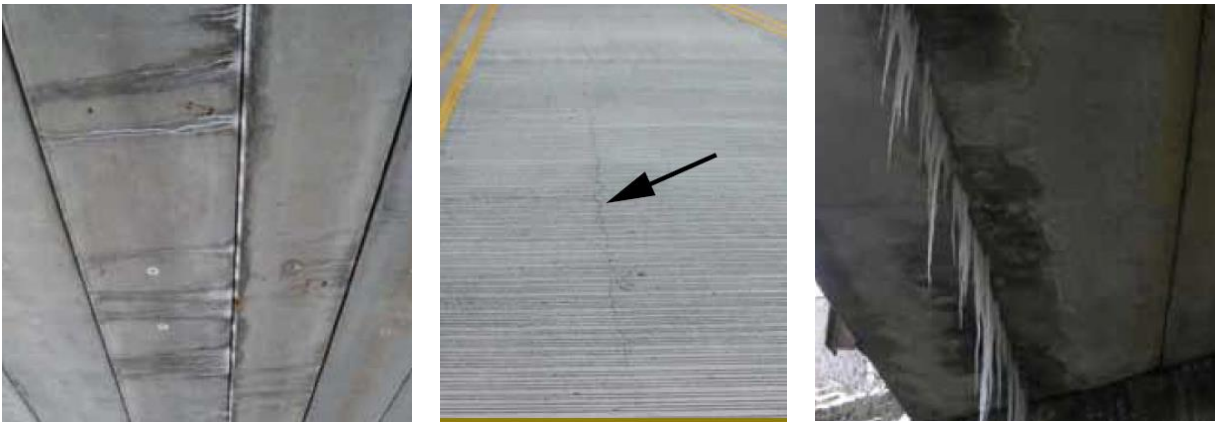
Major Problems reported in Adjacent Beam Bridges: Longitudinal Crack along the Joint and Water and Chloride Penetration (retrieved from Russell, 2011)
